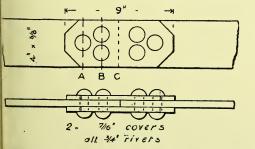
Cross Section of Riveted Joint in Tie-Bar.
